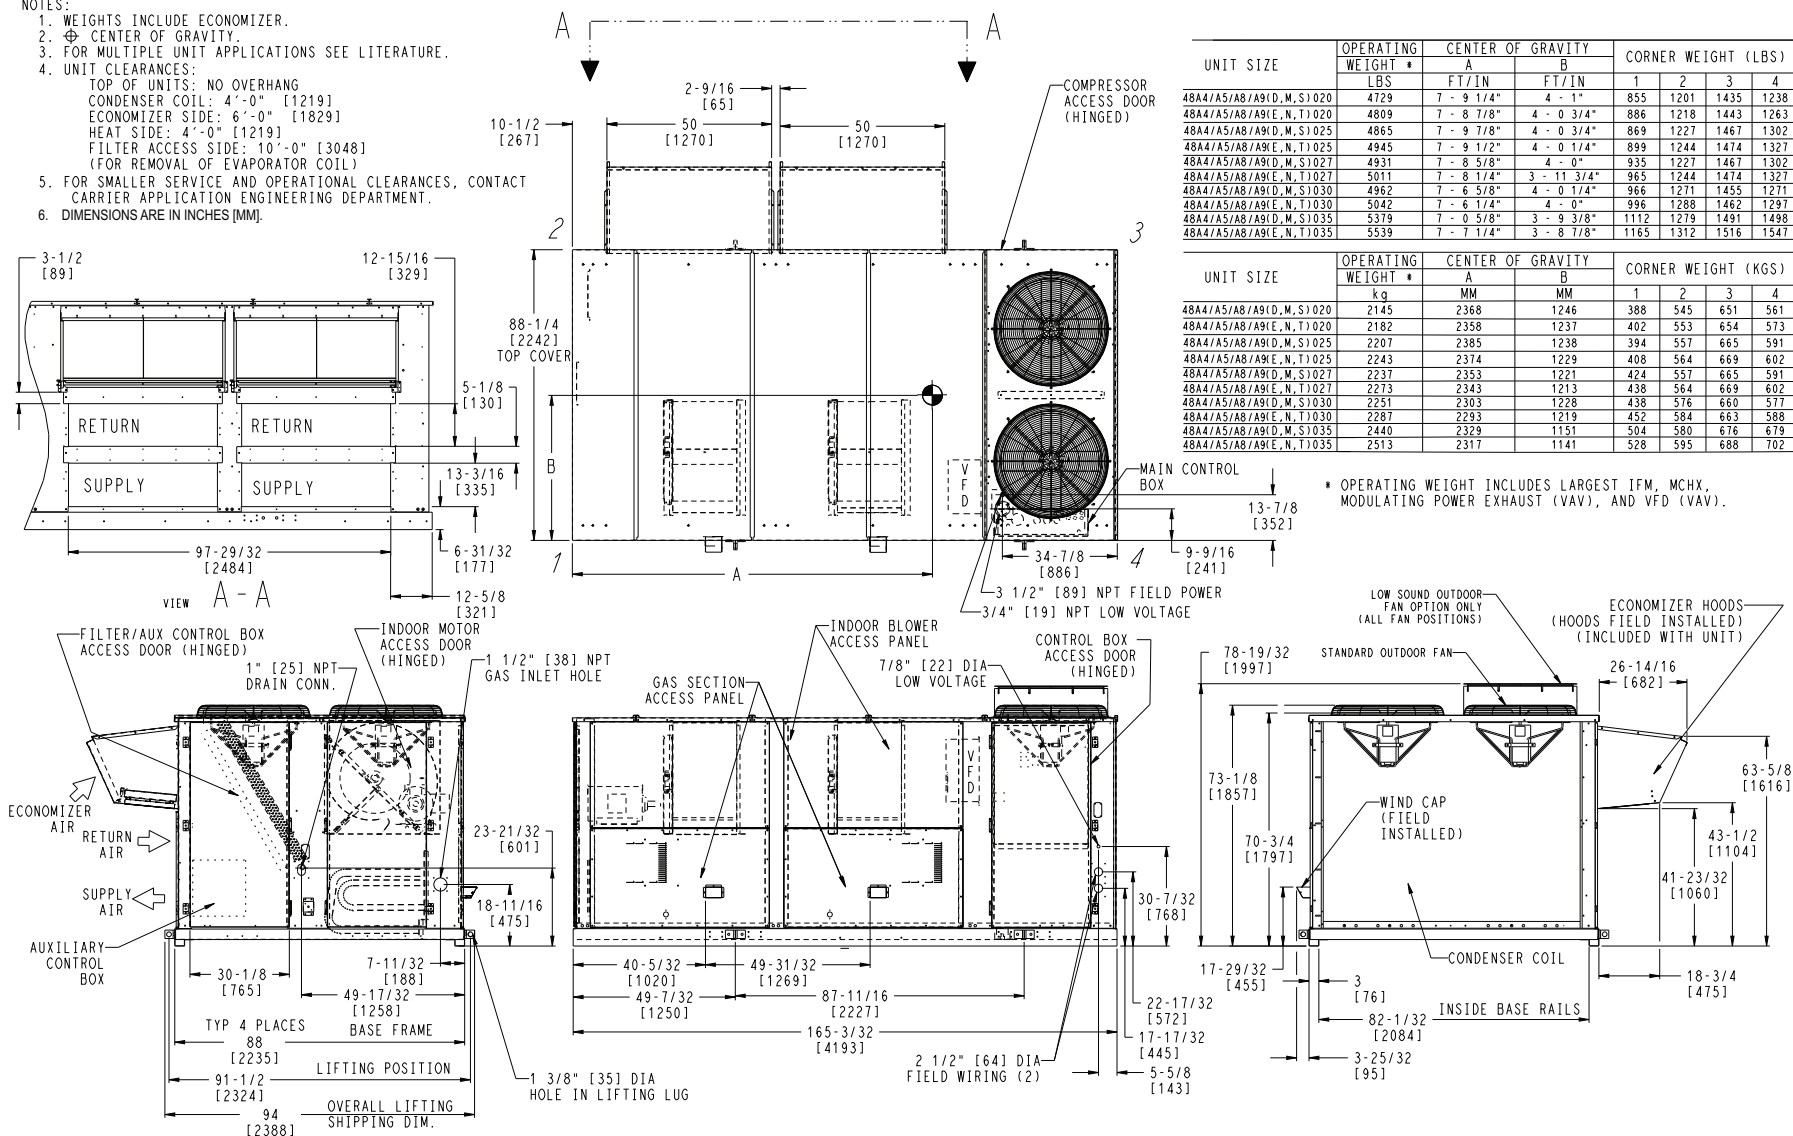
Base Unit Dimensions — 48A4,A5,A8,A9020-035
